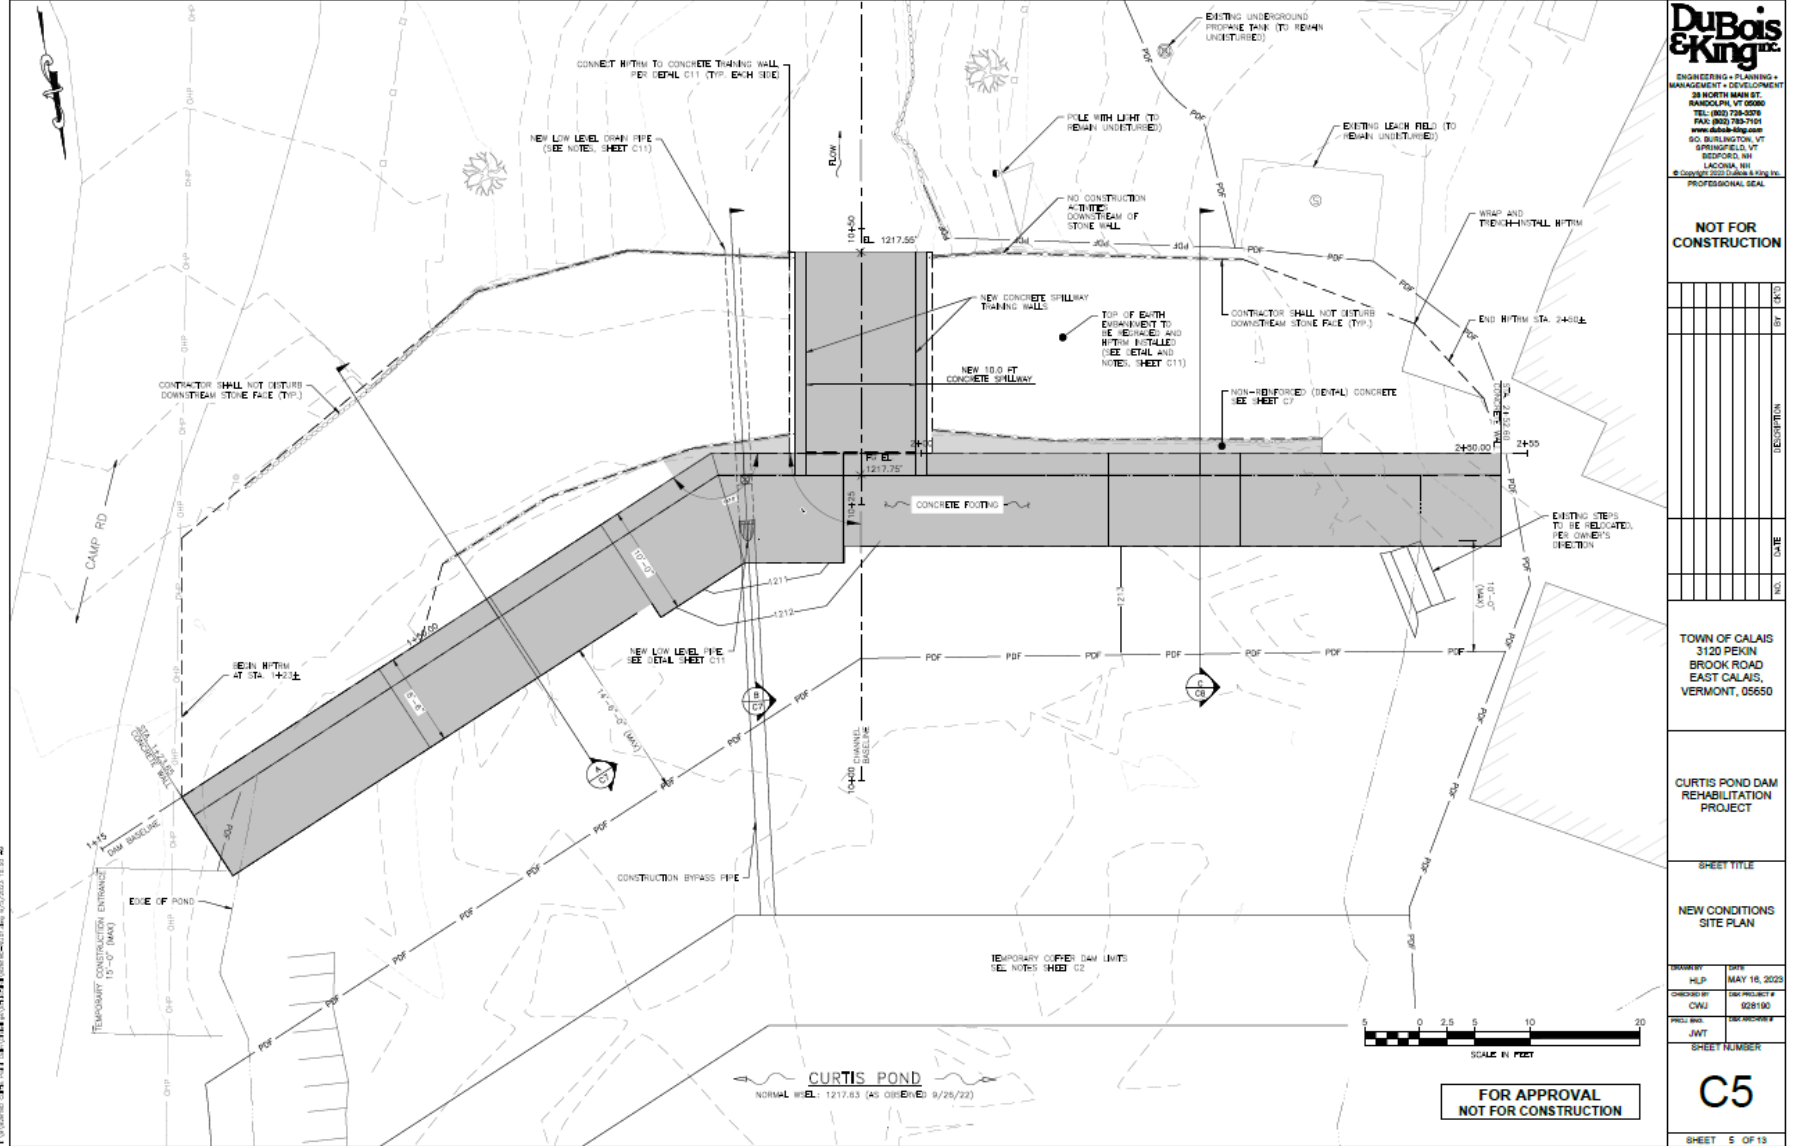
Proposed New Conditions Site Plan for the Curtis Pond Dam Rehabilitation Project (DuBois & King, Inc. 2023).
